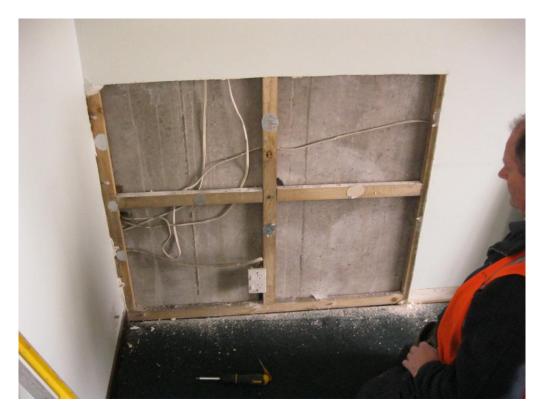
Connection between cast in situ floor slab and precast panel wall at second floor level.
